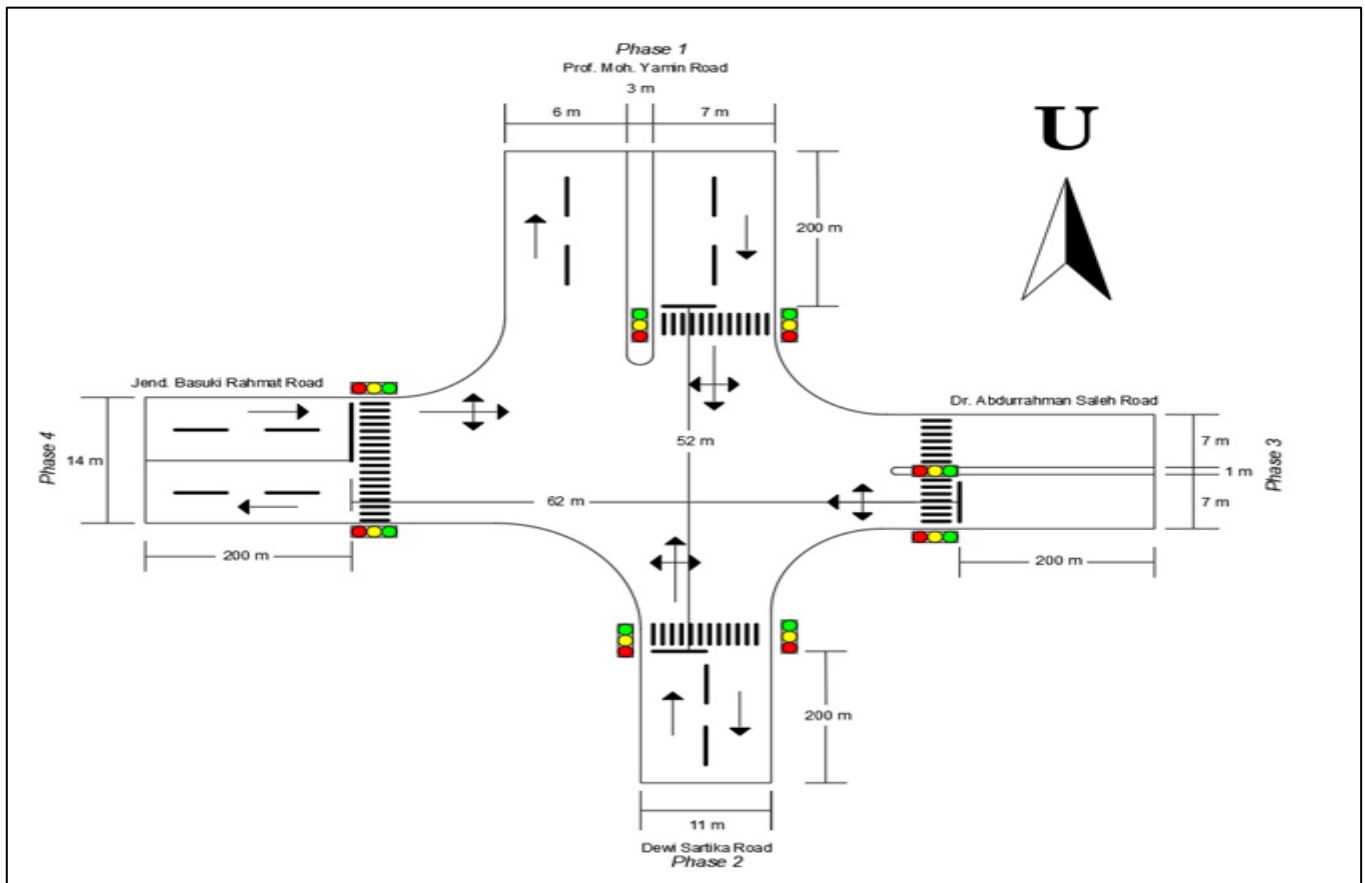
Geometric Intersection of Prof. Moh Yamin Road – DR. Abdurrahman Saleh Road
